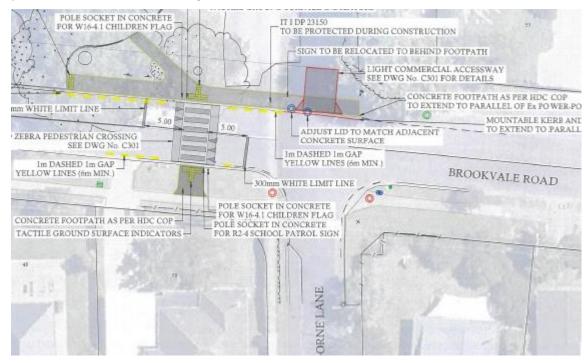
Location and plan of the Zebra Crossing on Brookvale Road west of Legorne Lane
